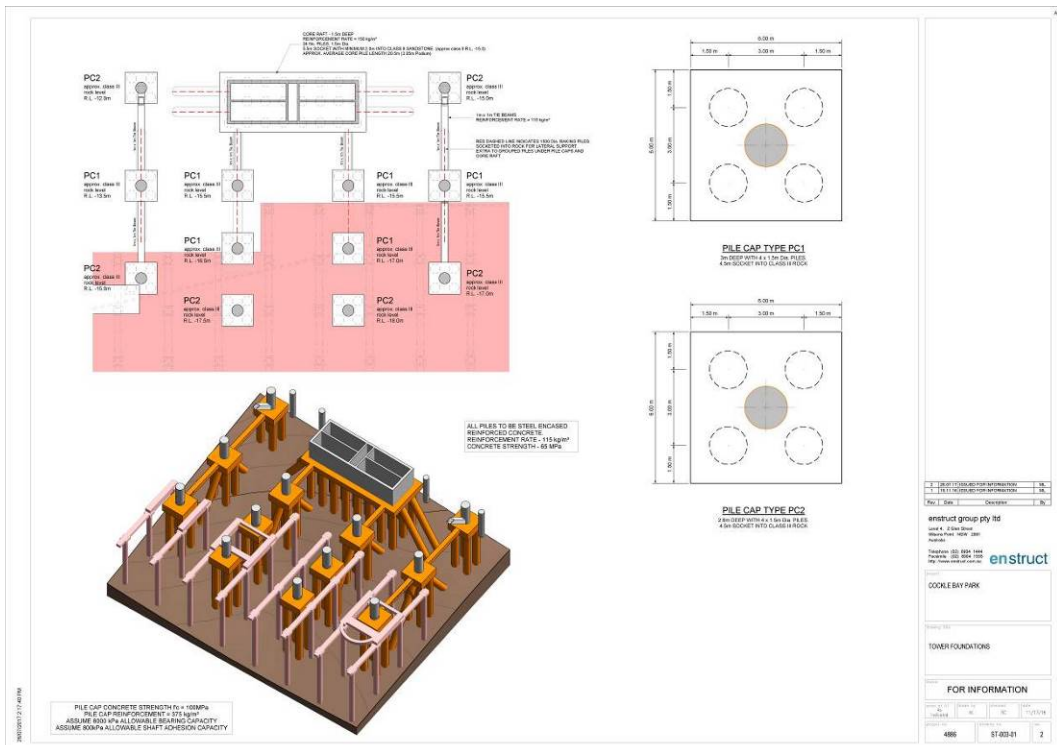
Initial structural plan of the tower foundations for Cockle Bay Park.⁶⁷
